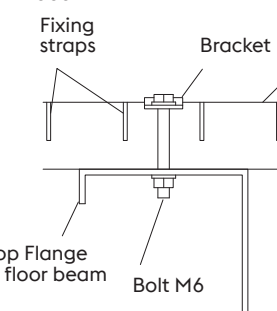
Layout of the bolts fixing the deck made of gratings to the floor beams
